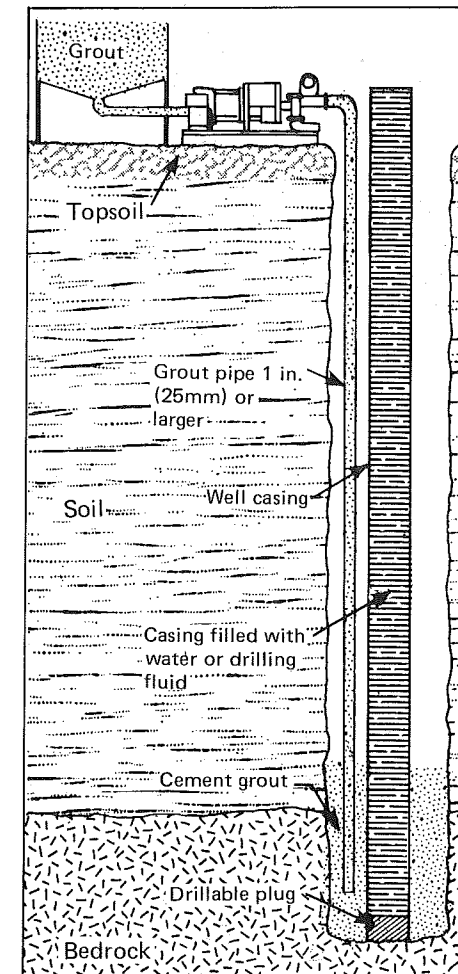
Outside tremie pipe grouting method. (From Driscoll, 1986)
